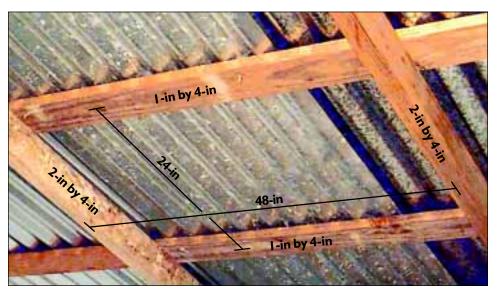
Typical wooden roof structure with metal roof panels above. Nails connected the metal panels to the nailers and the nailers were nailed to the joists.
